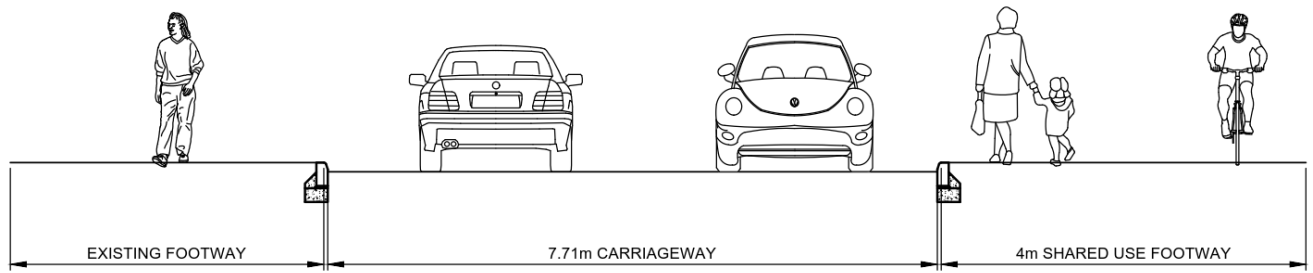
Cross Section Route 6 – A199 to Railway Bridge
